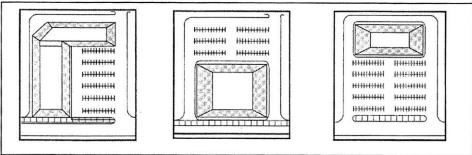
Parking location; the alternative site design at the right is prohibited (the center site design is preferred)
